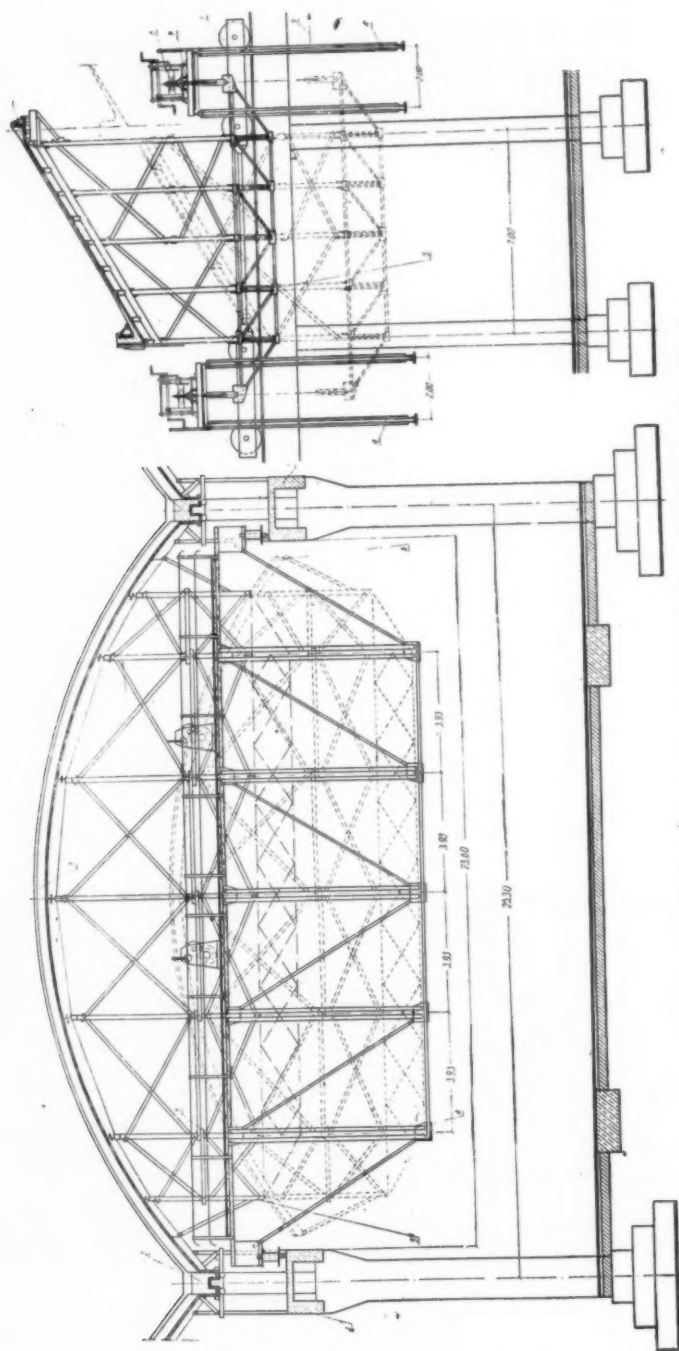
Travelling Falsework for constructing a Conoidal Shell Roof.
